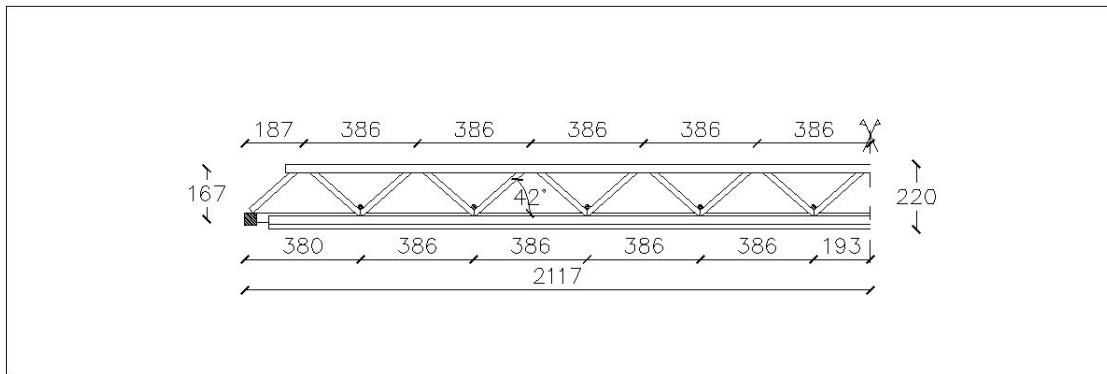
ECOTRAVE® RAFTILE® truss profile of beams 102n and 102
